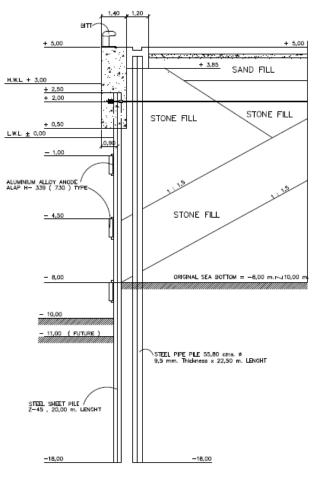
Cross section trough sheet pile wall at Berth N.1.
